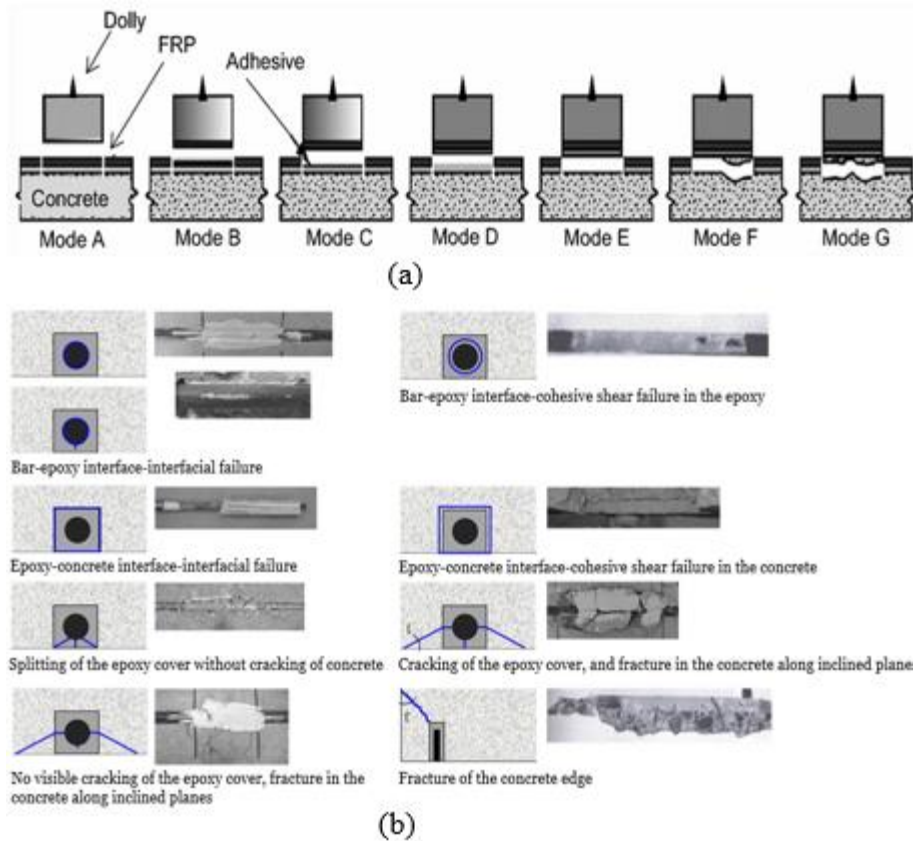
Failure modes of FRP-retrofitted concrete elements using EBR retrofitting [132] and (b) NSM retrofitting [36]. Notes for (a): A=Bonding epoxy failure at dolly (loading fixture), B= Cohesive failure in FRP laminate, C= Epoxy failure at FRP/epoxy interface, D= Cohesive failure in epoxy, E= Epoxy failure at FRP/concrete interface, F=Mixed cohesive failure in concrete and epoxy at the epoxy/concrete interface and G= Cohesive failure in the concrete substrate.
